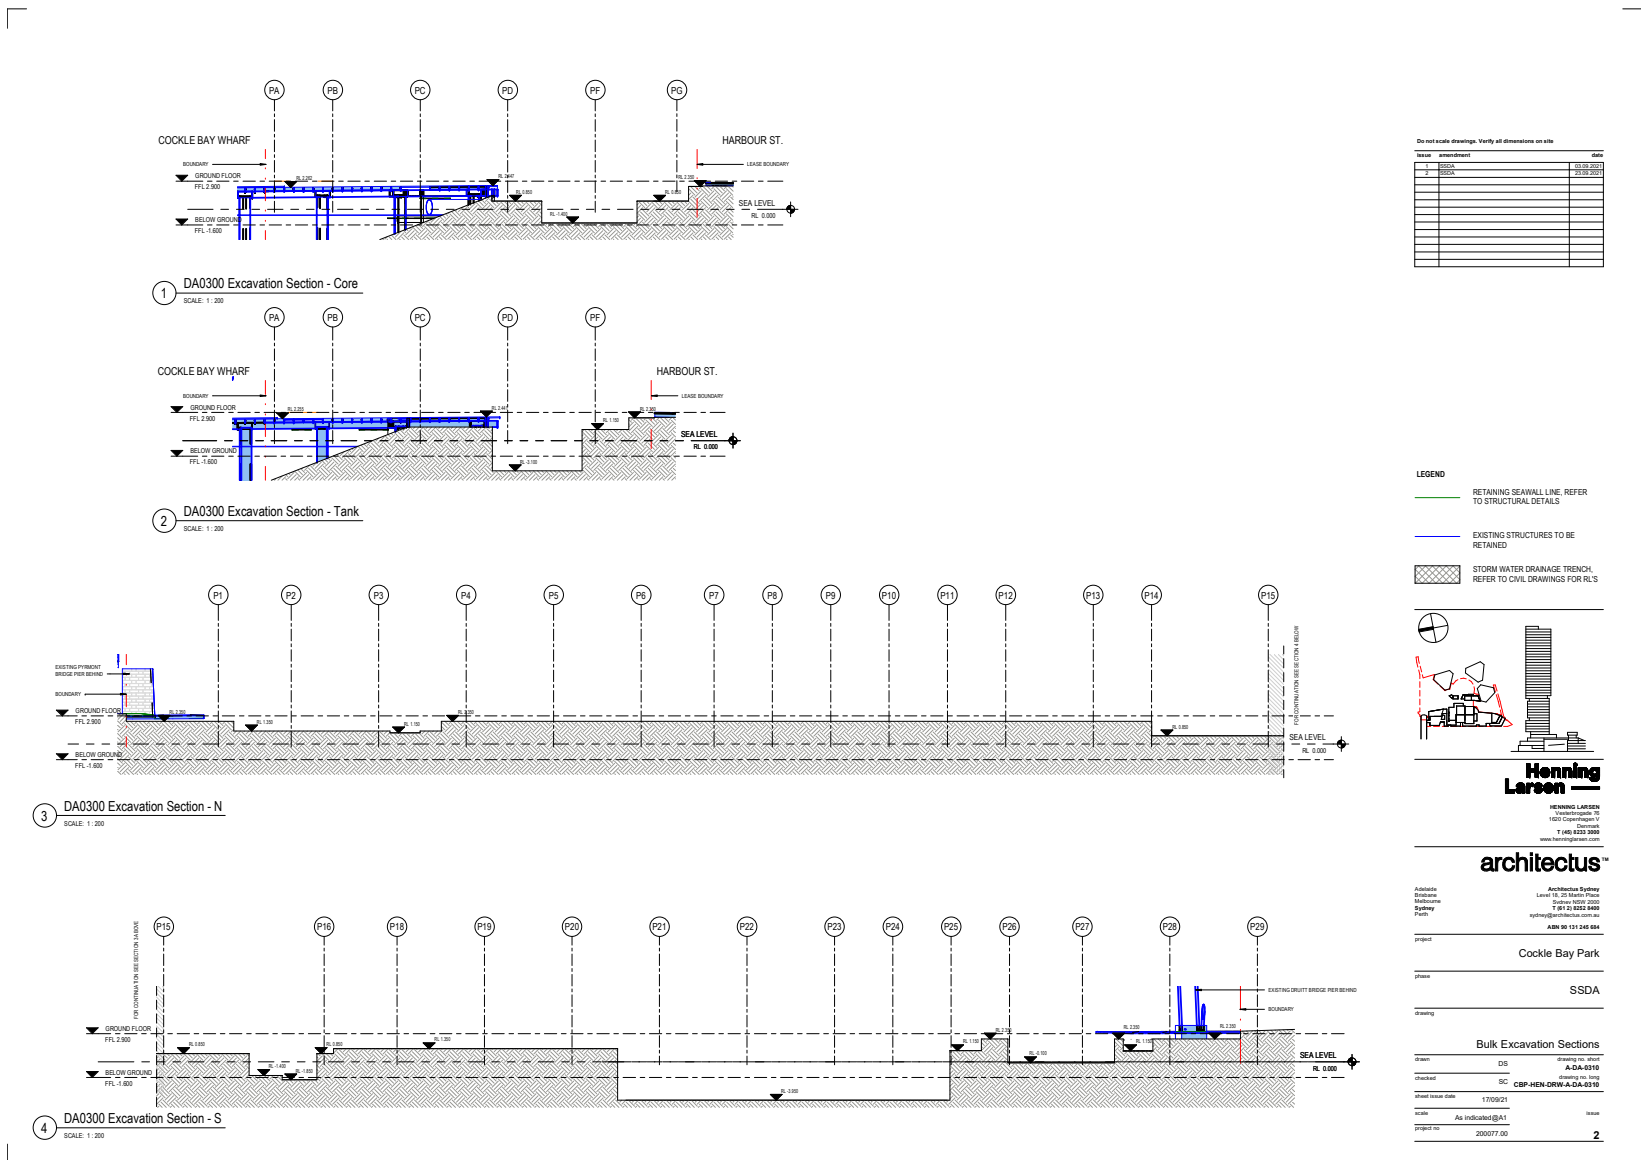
Section drawing of proposed bulk excavation. Drawing No. A-DA-0310 dated 17.09.2021.
